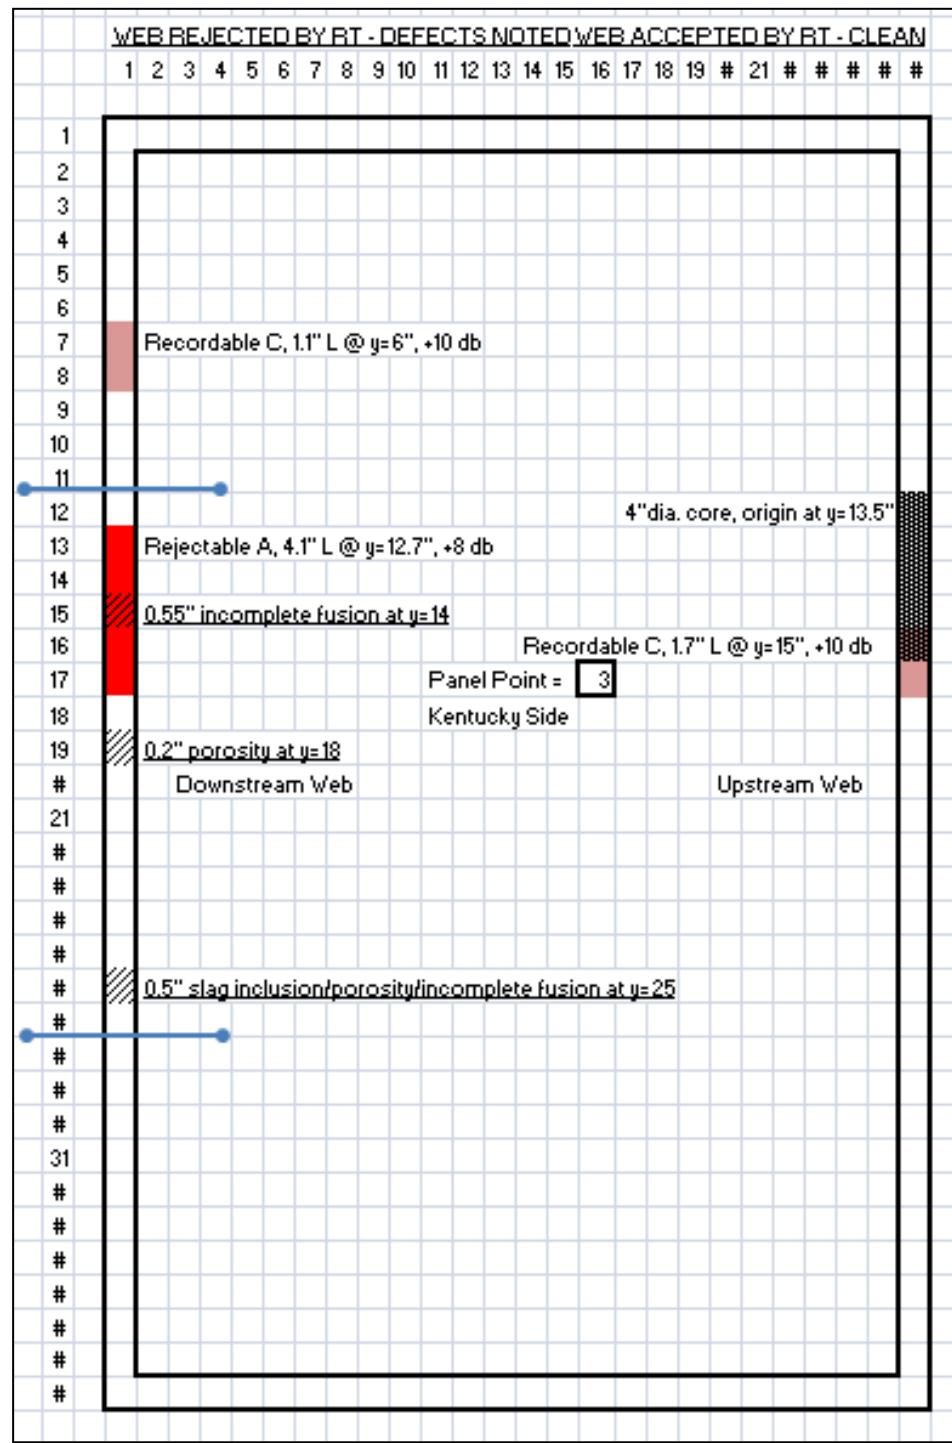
Cross section of panel point T-3 (Kentucky Side).
